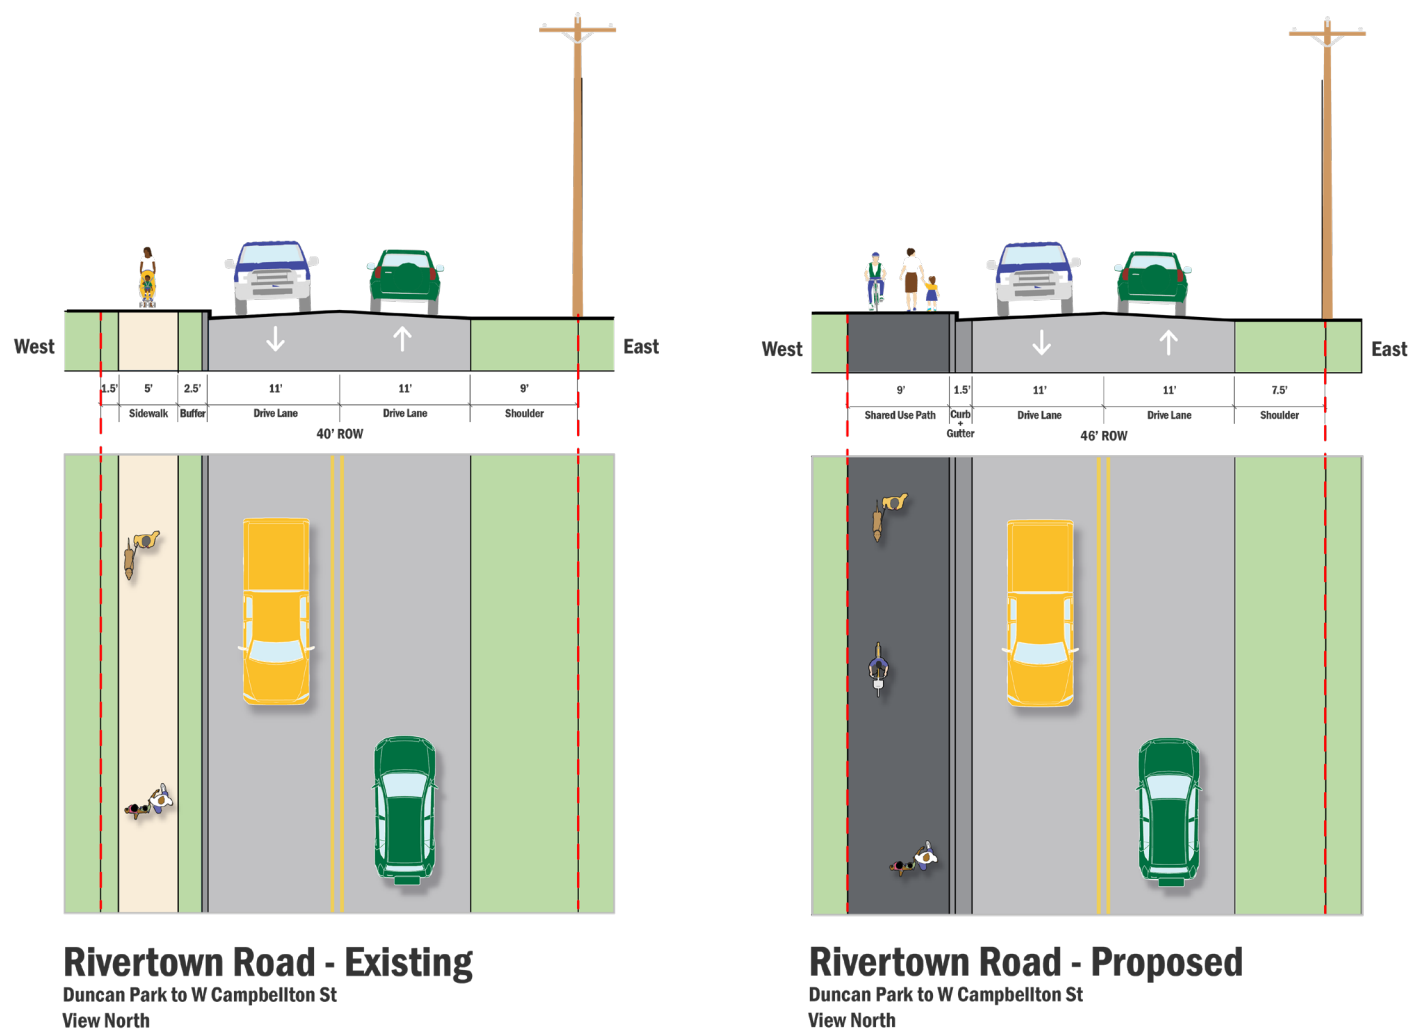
Rivertown Road Existing and Proposed Typical Sections
